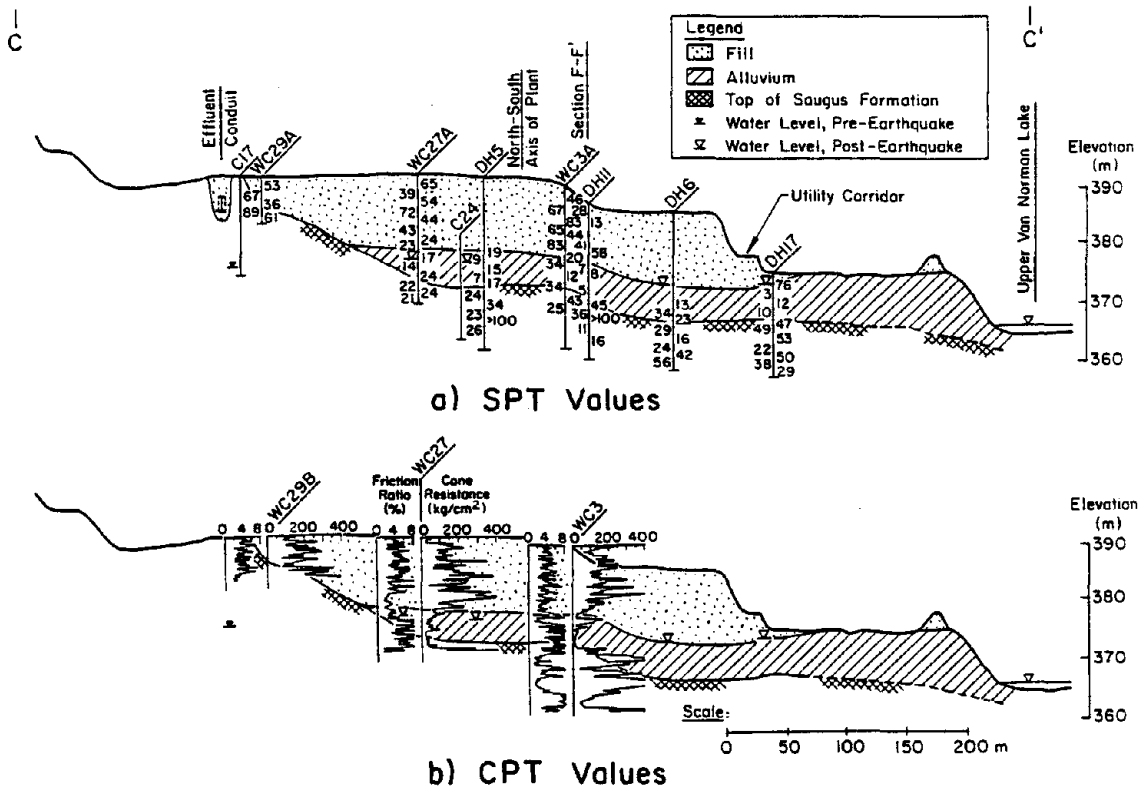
Soil Profile at Cross-Section C-C', Jensen Plant
